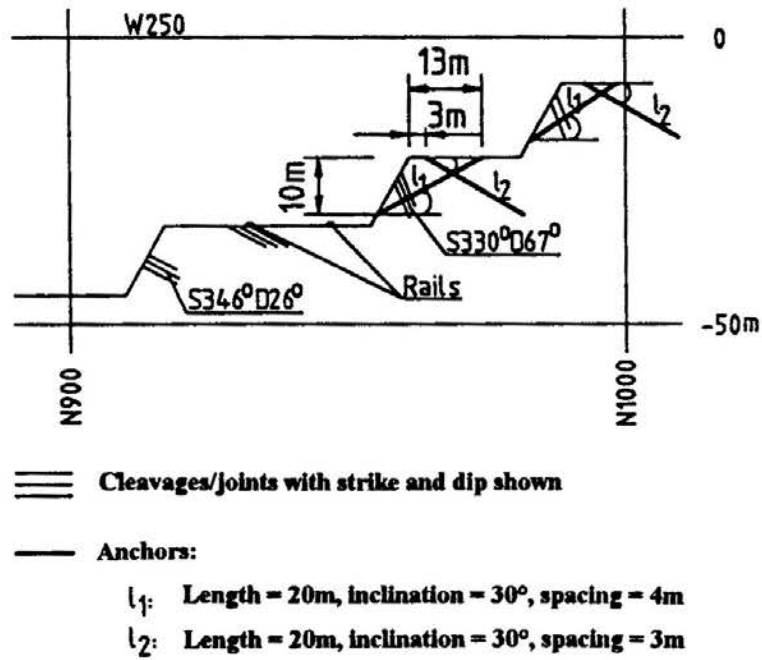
Cross-Section and Anchor Layout for Slopes at Station W250
